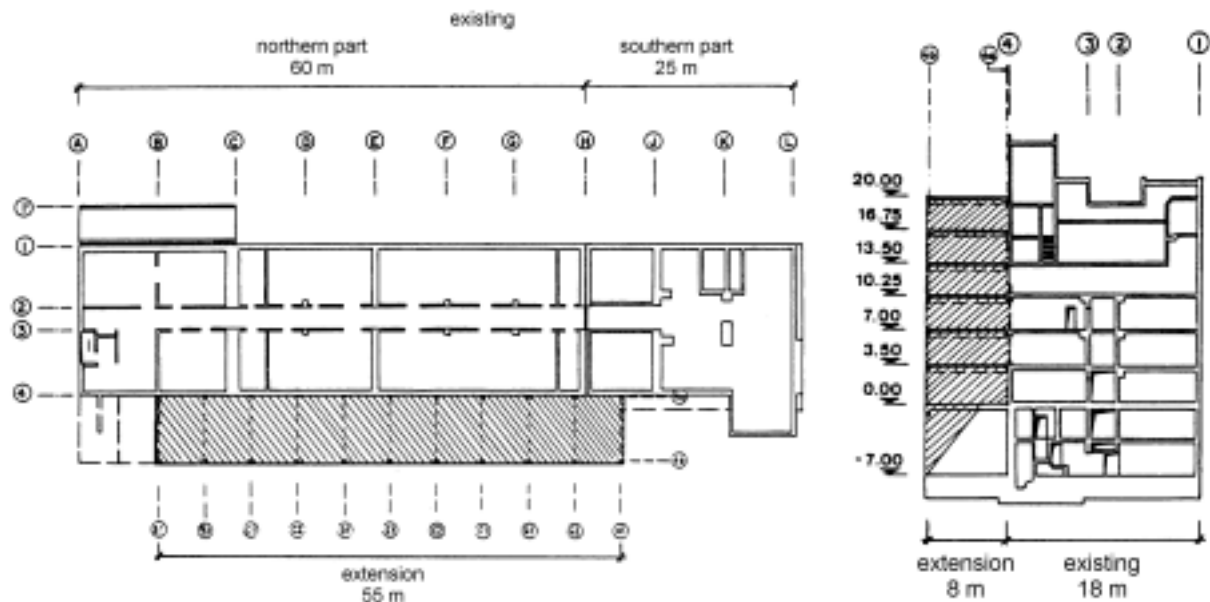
Overview on the KKL operation building with the first extension ([2])
